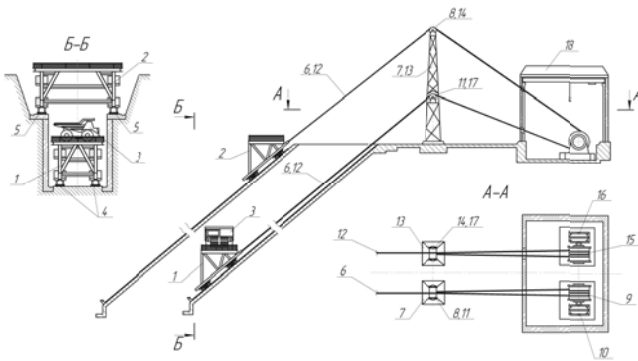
General view of a single-sided hoisting plant in a vertical plane of two parallel tracks
